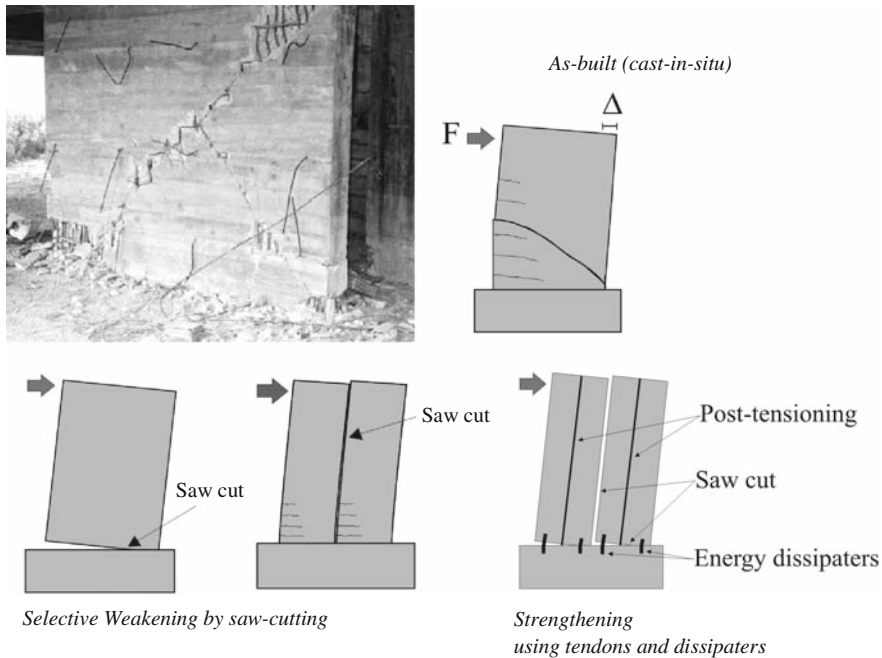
Typical shear failure mechanism in an existing under-designed RC wall and conceptual application of the proposed selective weakening technique (modified after [42])
